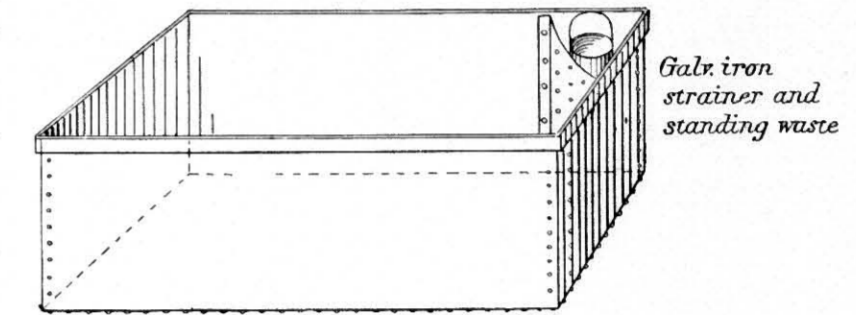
Galvanized-iron Sink for Washing Metal Utensils.
